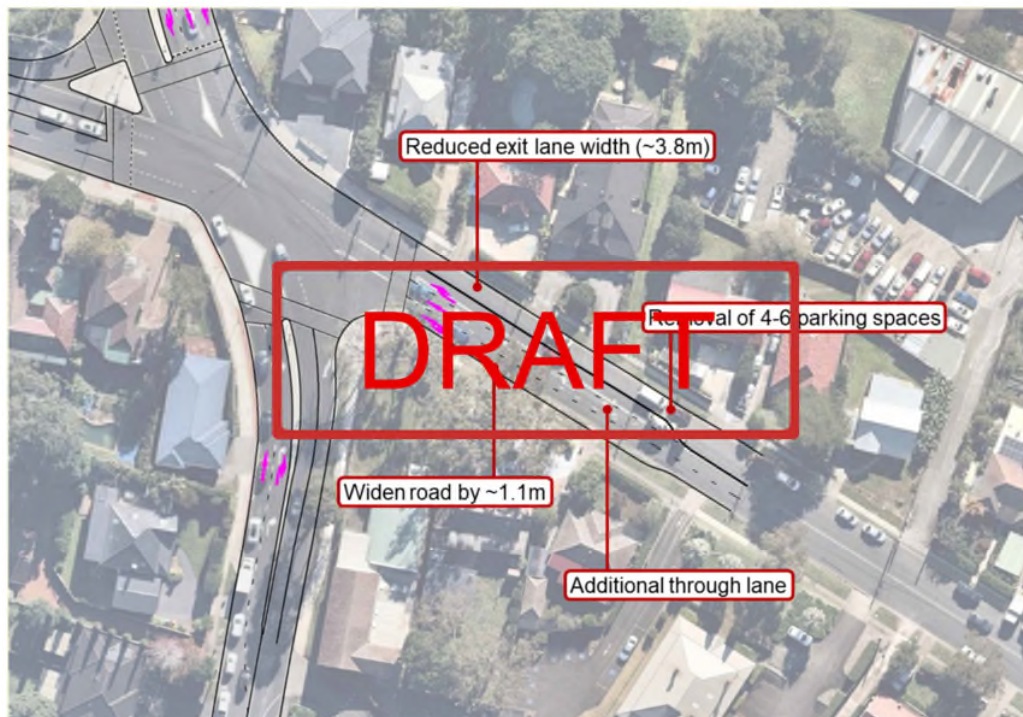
Proposed Intersection Layout – Duffy Avenue / Chilvers Road / The Esplanade
